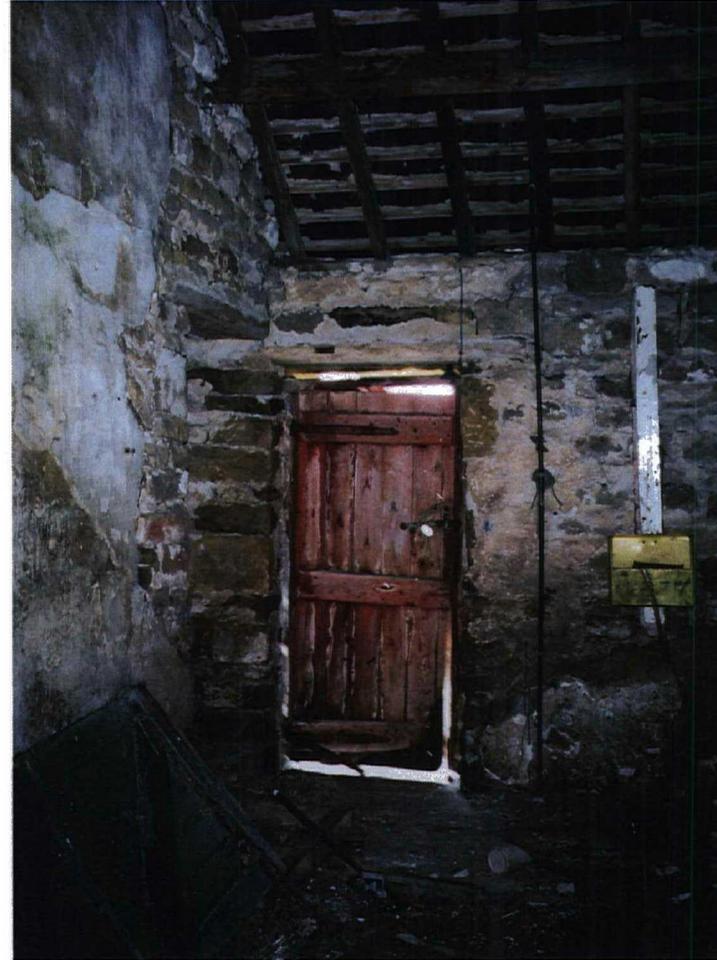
Brackenridge OF. West end 1<sup>st</sup> floor interior looking south.
